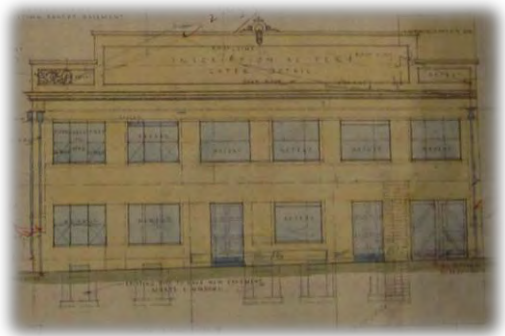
1928 proposed elevation (Hollinshed, MCC BPA11035)
